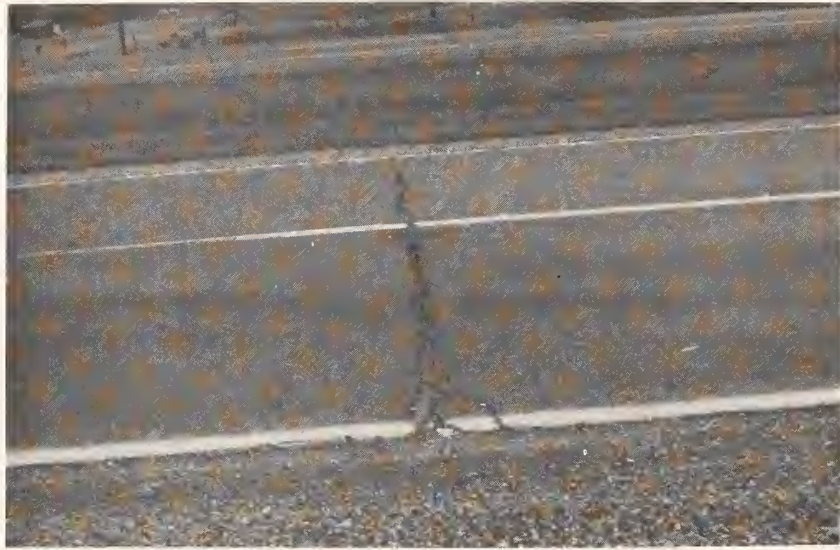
High Severity Joint Reflection Cracking from Transverse Joint in PCC Slab.
